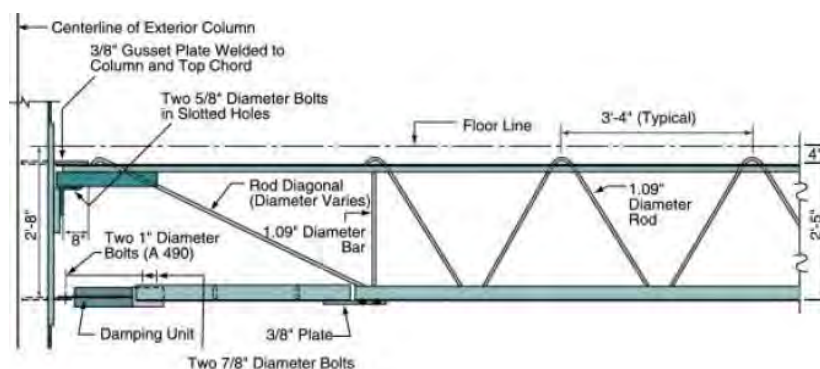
Metallic truss supporting the floor slabs (detail of connection floor-outer facade column)
